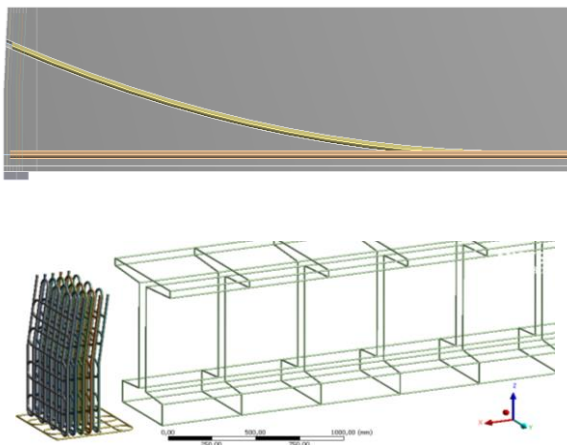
b. The FEM model of the beam – cable routes and reinforcement of the anchoring area
